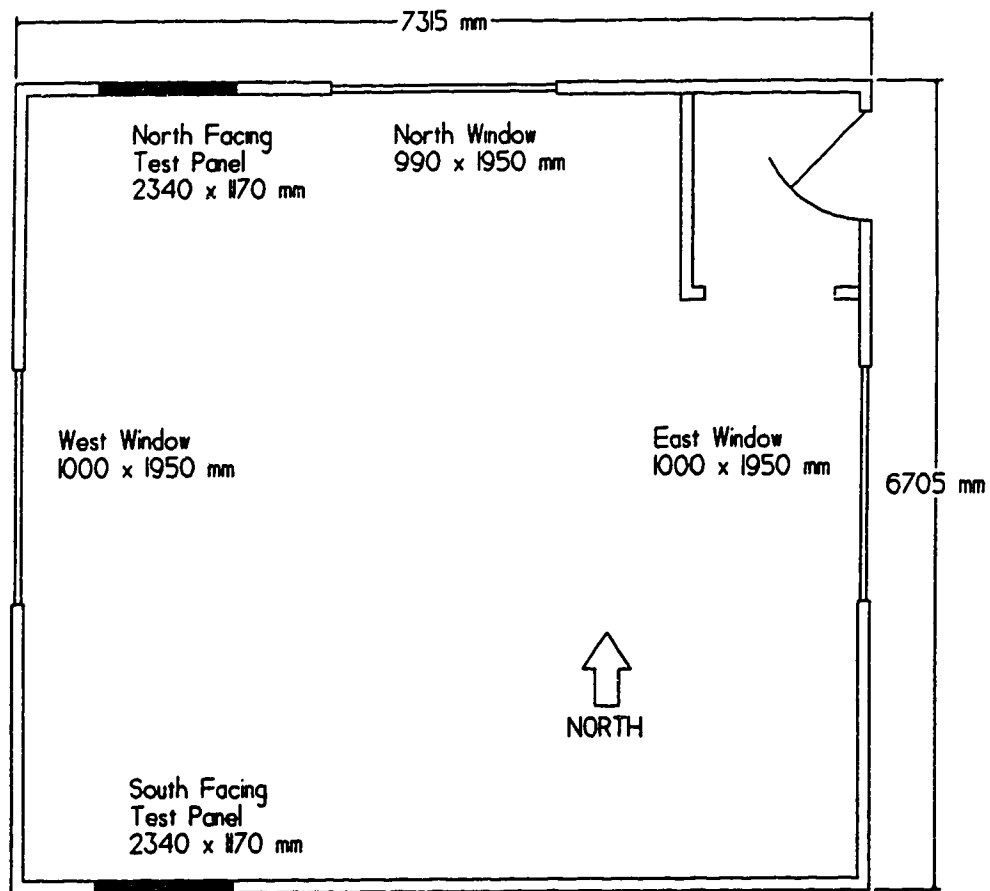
Plan view of House 6 at the Alberta Home Heating Research Facility showing the location of the wall test panels in the north and south walls.
